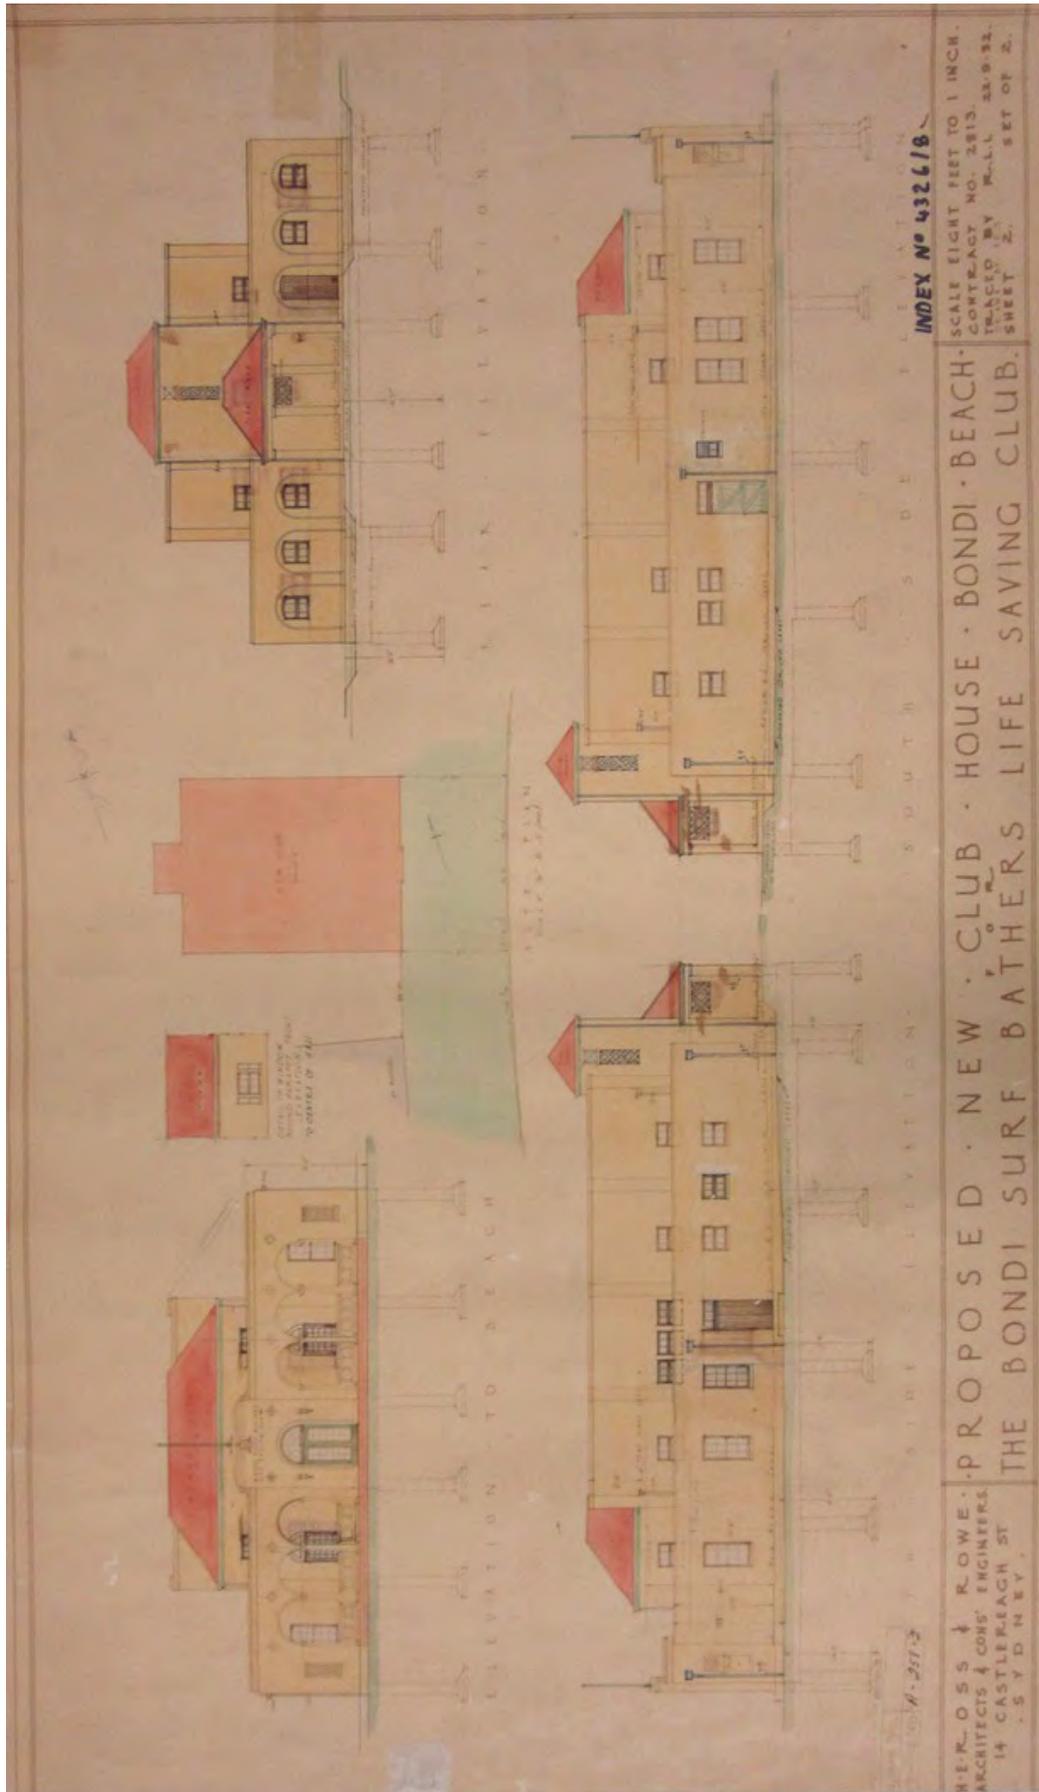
Drawing showing the original design of the surf club with the side rooms having flat roofs. The front elevation is similar to the revised scheme but the walls of the sunbaking terrace are exposed on the side elevations. Source: Jean Rice Architect, photographed at WLS.
